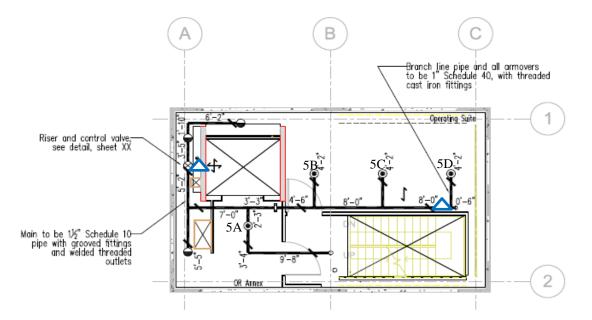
Floor 5 sprinkler system design layout and specifications
